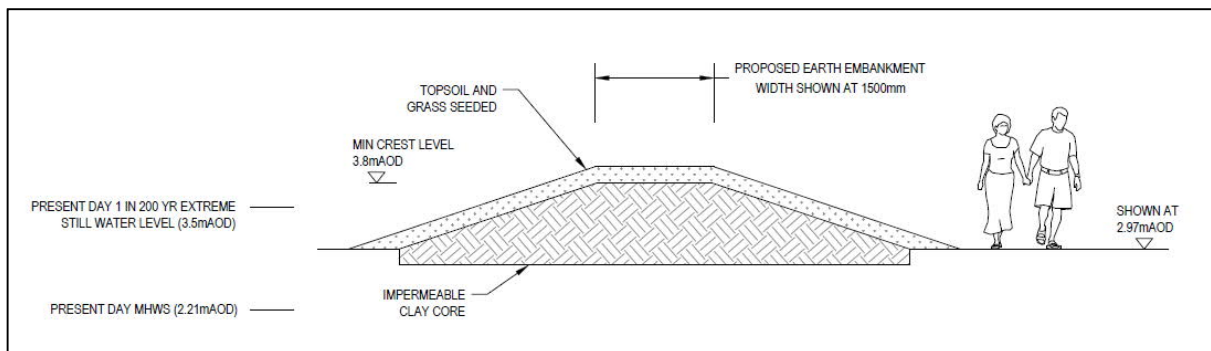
Sketch of indicative cross section of earth embankment in south section of ODU 2b (not to scale).
